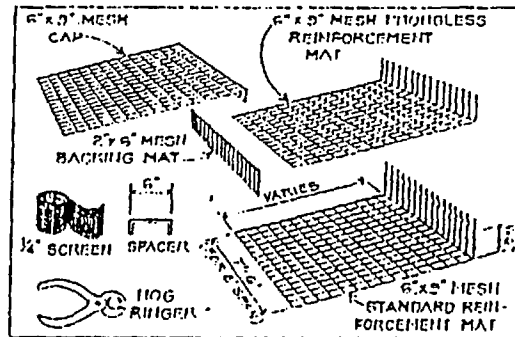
Accessories used for the construction of welded wire wall (after Hilfiker Co., 1988).
